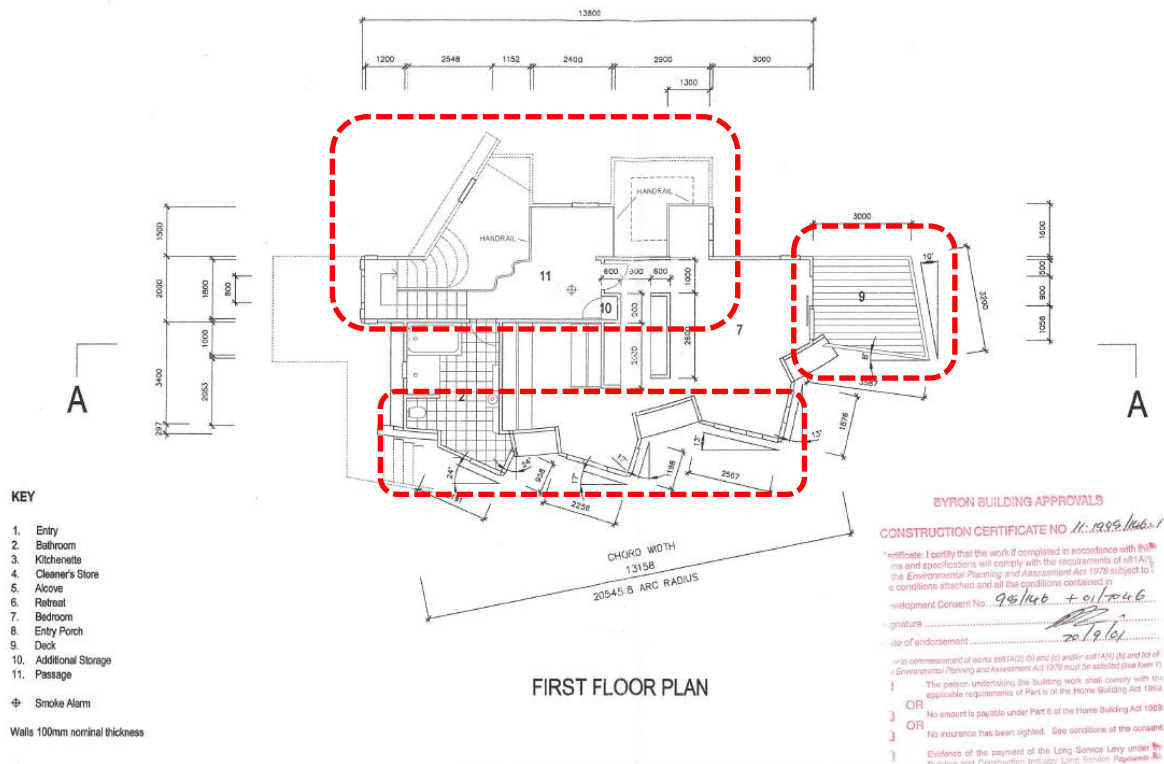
Extract from "Type A" first floor CC stamped plans (11.1998.146.1)
